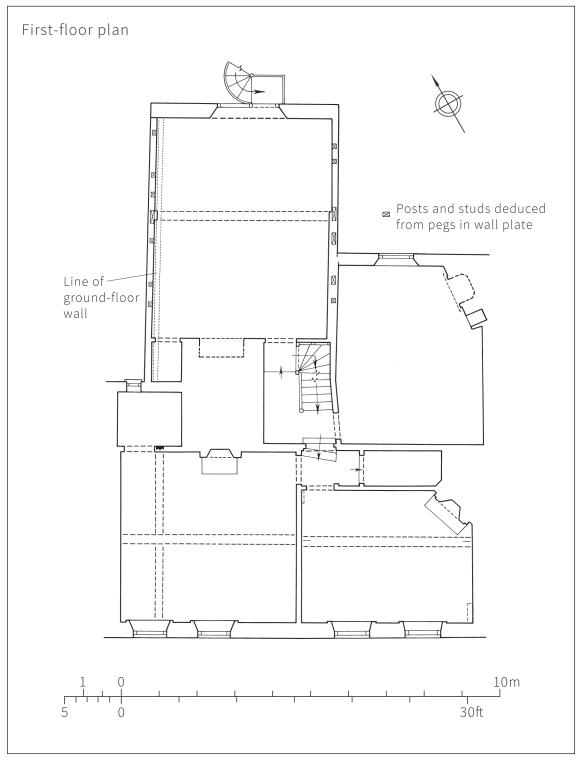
5 Market Place, plan of first floor (Drawing Allan Adams © Historic England).
